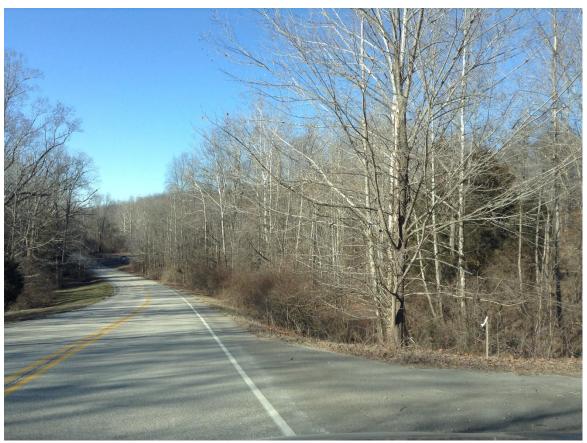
E Allens Creek RD; road cut to existing lake on Tract 2
